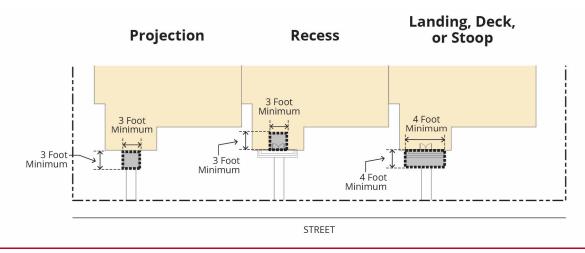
B MULTI-UNIT DWELLINGS, INDIVIDUAL ENTRANCE DESIGN
